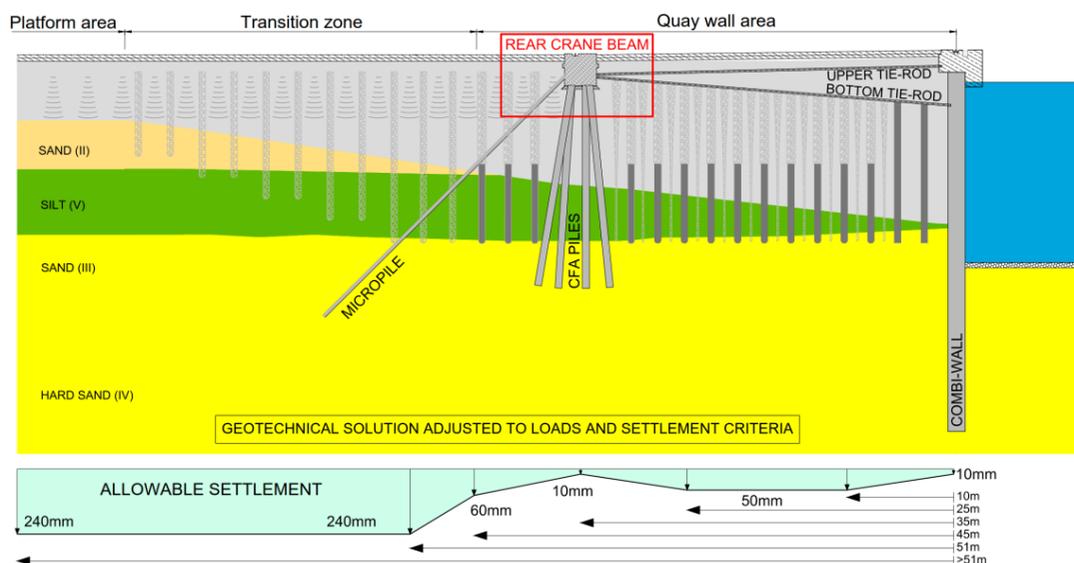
A typical cross-section of the quay wall in offshore part of the project
